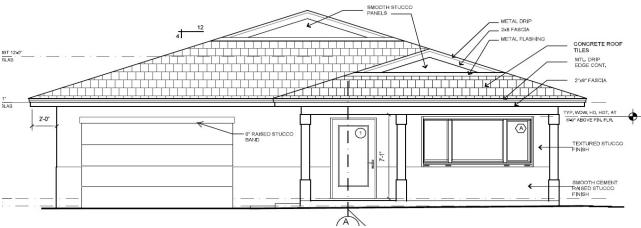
Front Elevation 403 S M Street (As Proposed)
